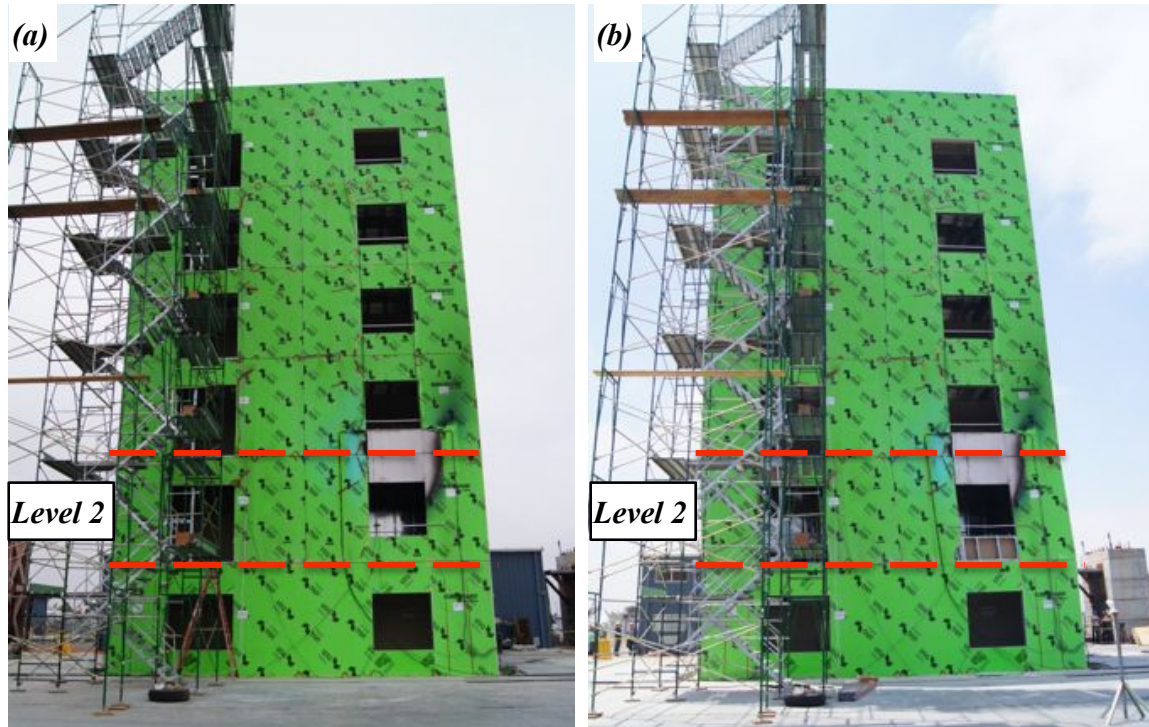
North elevation of the test building: (a) pre-EQ9 condition, and (b) pre-EQ9 condition.
